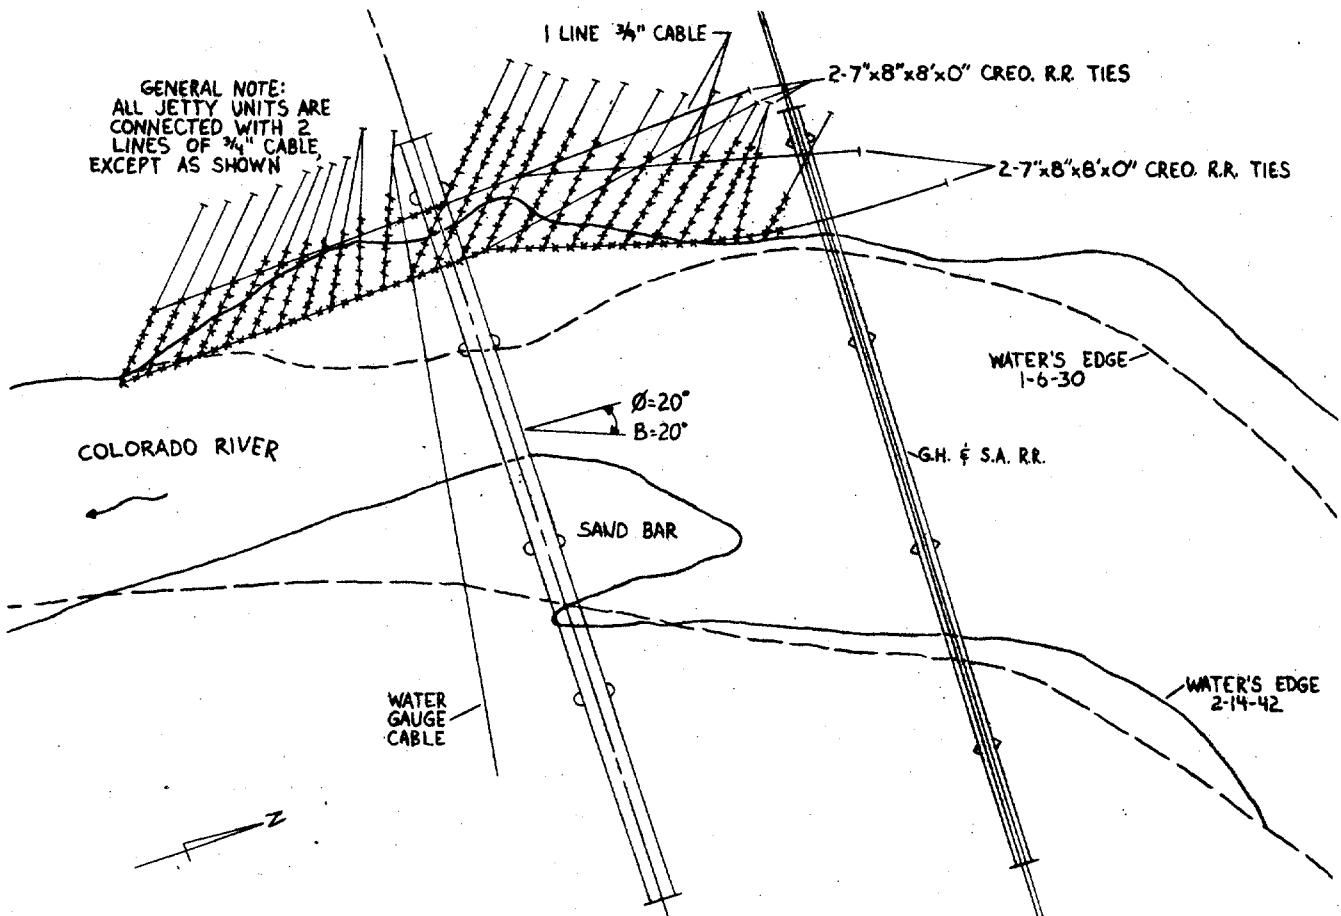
Plan of crossing showing location of steel-jack field, Colorado River.
